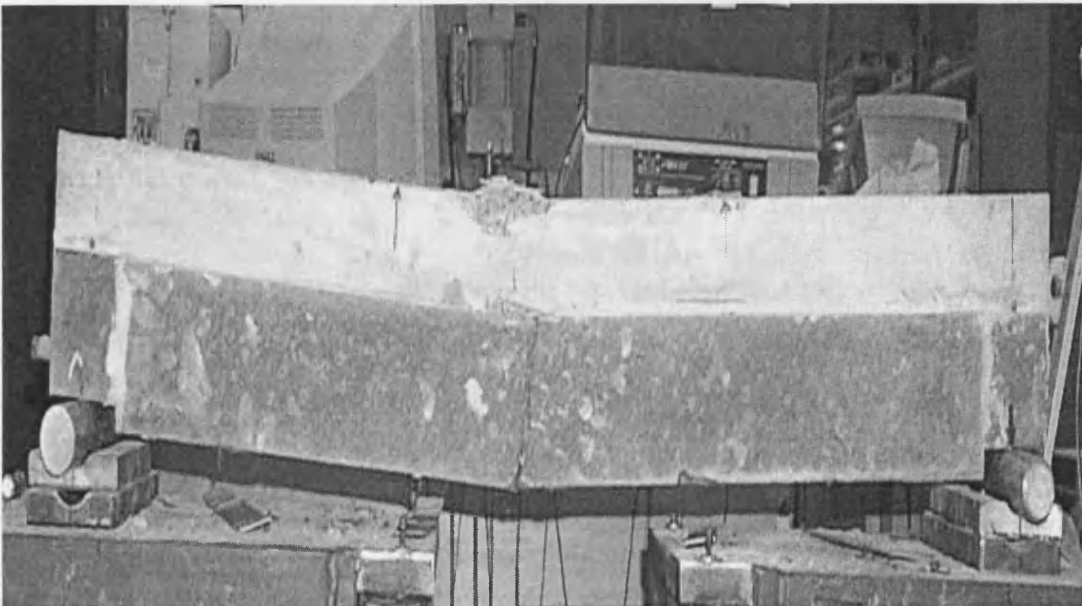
Typical flexural failure of beams retrofitted with three long and four short strips
